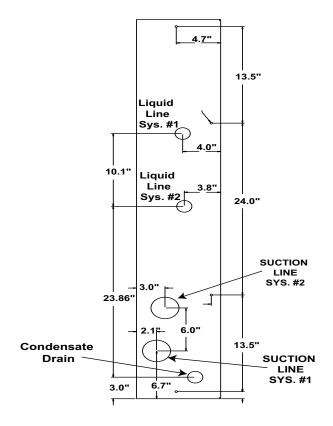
LB600 PIPING CONNECTIONS - END PANEL DETAIL
